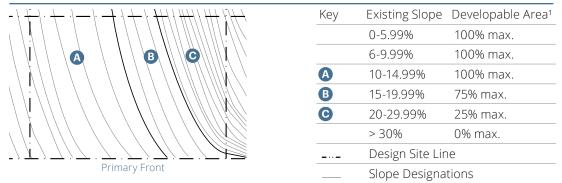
Example for Defining Sloped and Steeply Sloped Design Sites
